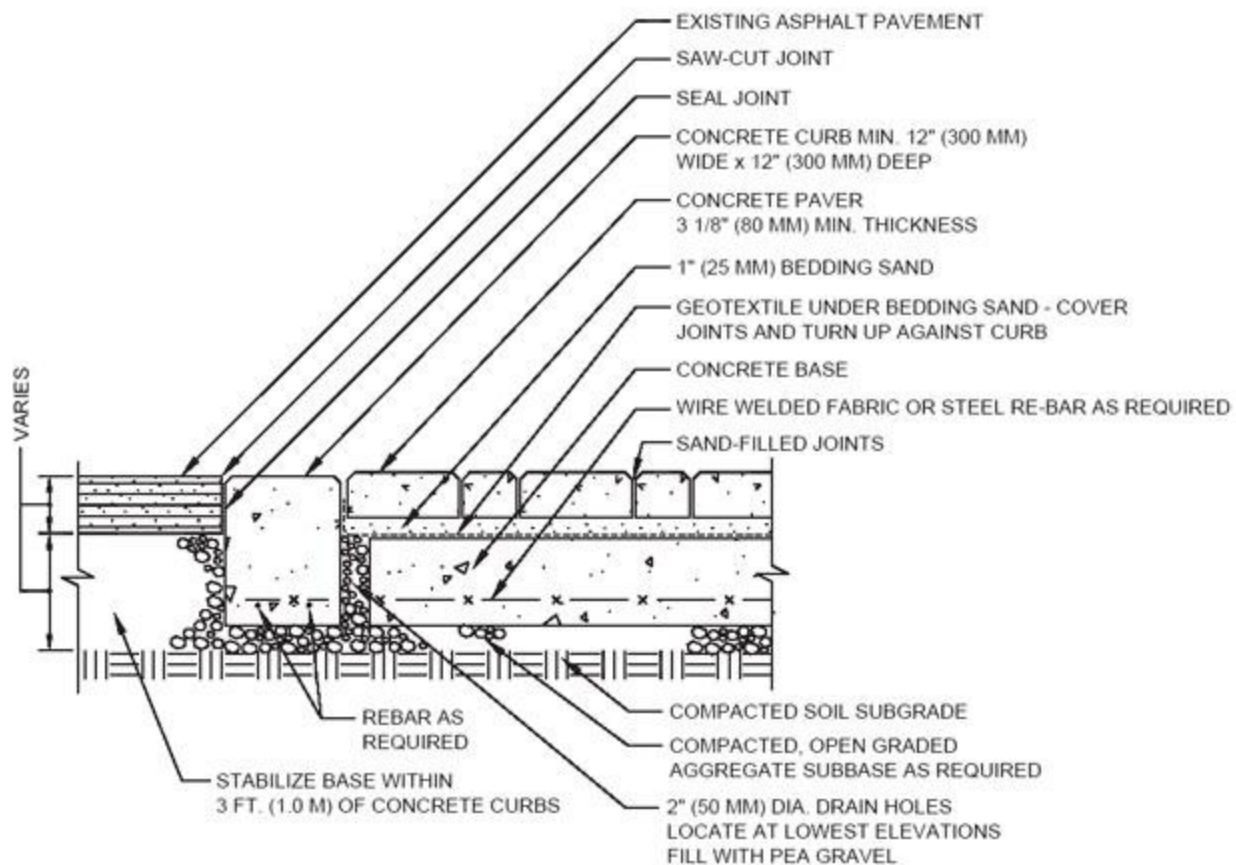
Recommended detail for sand set pavers over a concrete base. Drainage holes provide drainage for water that enters the bedding layer through the joints. The same detail applies for paver overlays on asphalt.
